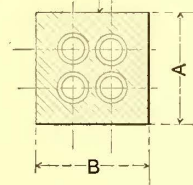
SECTION OF TRACK CONSTRUCTION
